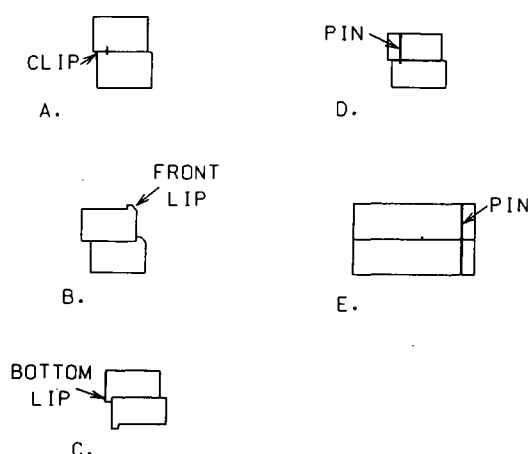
Retaining wall systems tested: (a) Stonewall, (b) Allan, (c) Diamond, (d) Versa-Lok, (e) Rockwood.
